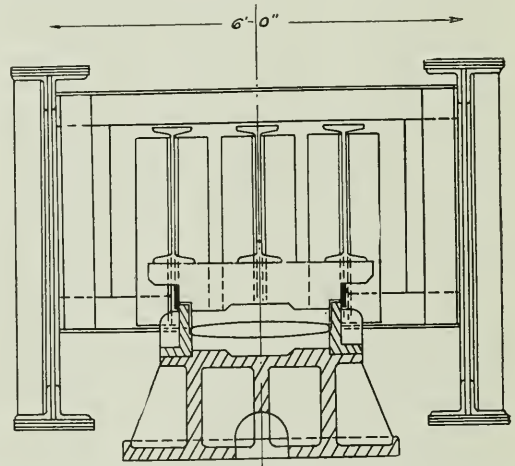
Section Through Bronze Disc, Centre Bearing.
